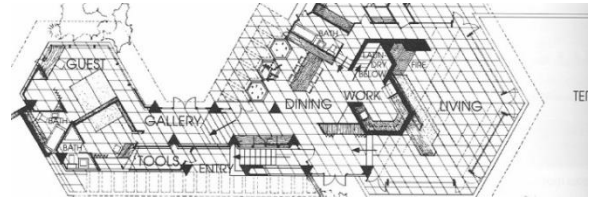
Frank Lloyd Wright, *Hanna House*, Partial floor plan showing hexagon module. 1937
